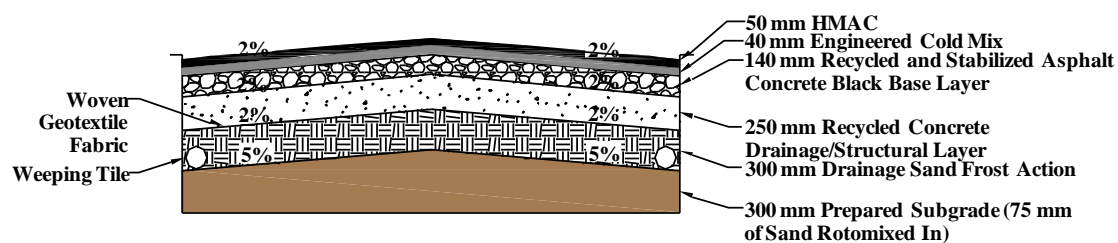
North Road Section 2 Cross Section (km 0.153 to km 0.322)
